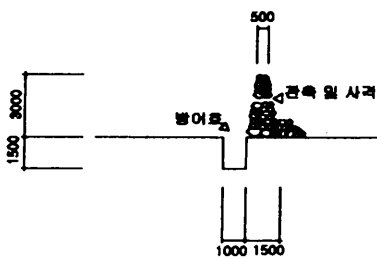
A Section of wall surrounded 4.3 rebel's village
